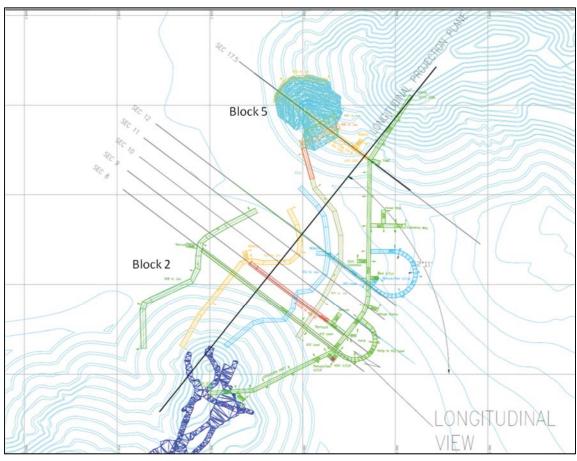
Plan View of Accesses to Underground Mining Blocks
